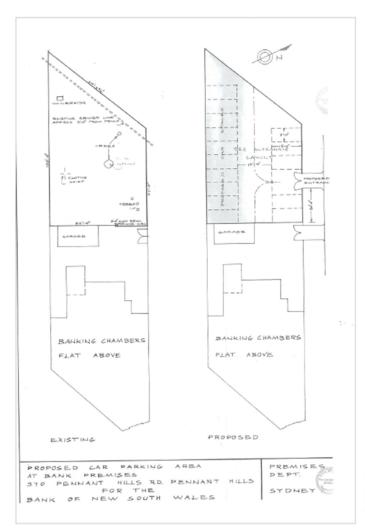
Undated plan showing then existing rear yard and proposed carpark. The outline of the Bank building suggests this postdates the c.1964 additions. Source: Westpac Archives
